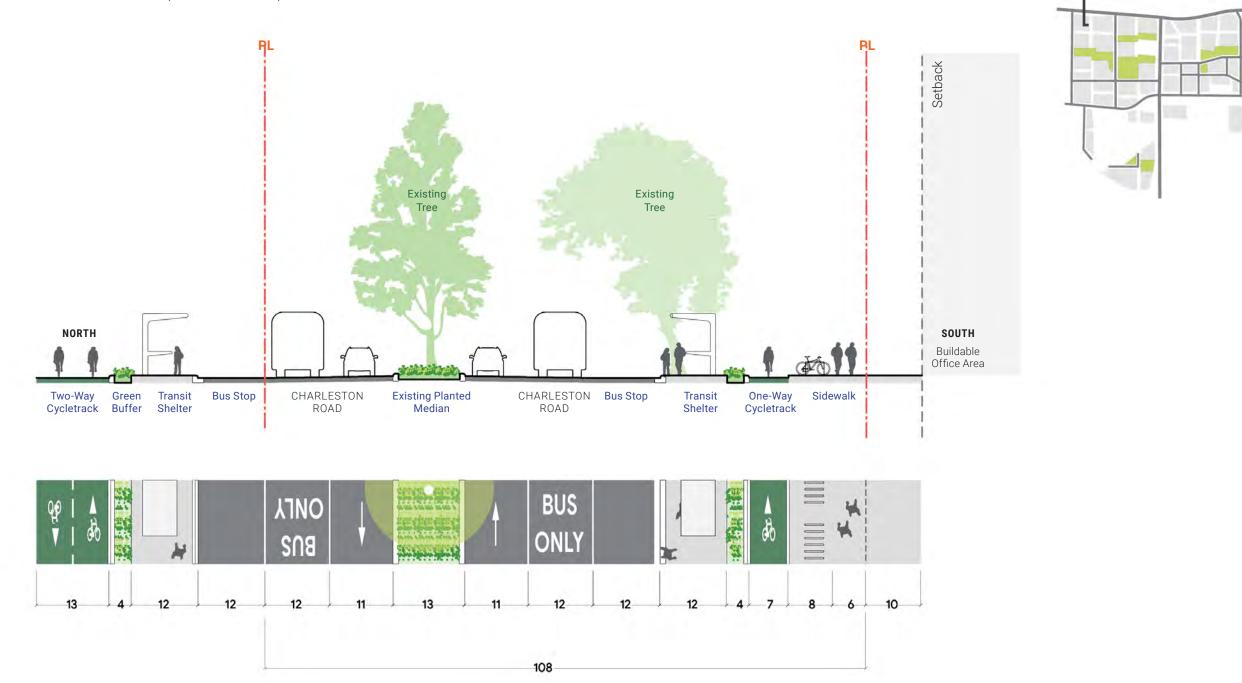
CHARLESTON ROAD SECTION 02 (WEST OF SHORELINE)
